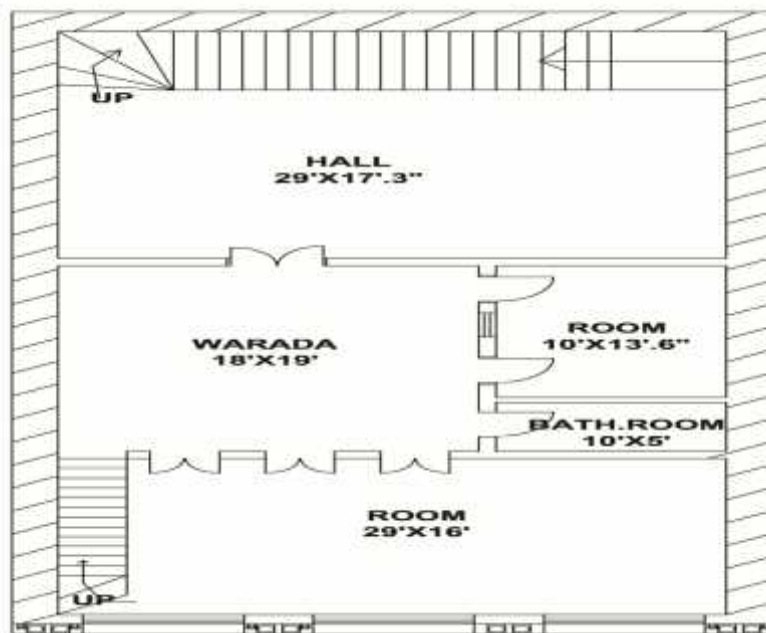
Second floor plan (courtesy: Mr. Adnan Anwar)
